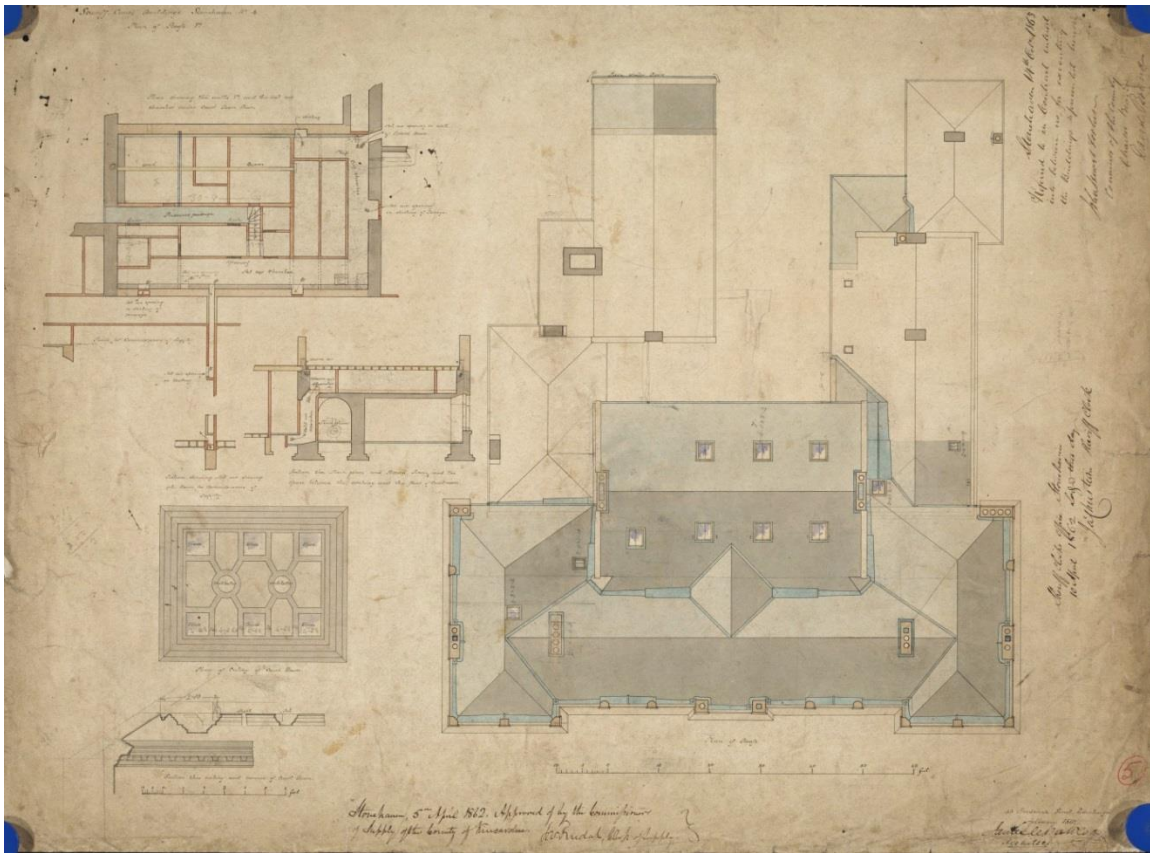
, 28, 29 and 30 (below). Interior details dating to 1862 addition.
